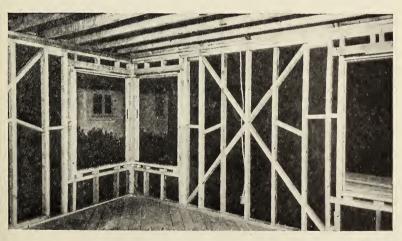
Note how timber is used to make the frame of a house. When studding is cut to make an opening for a window or a door, double-framing is used around the opening. (Courtesy West Coast Lumberman's Association)
